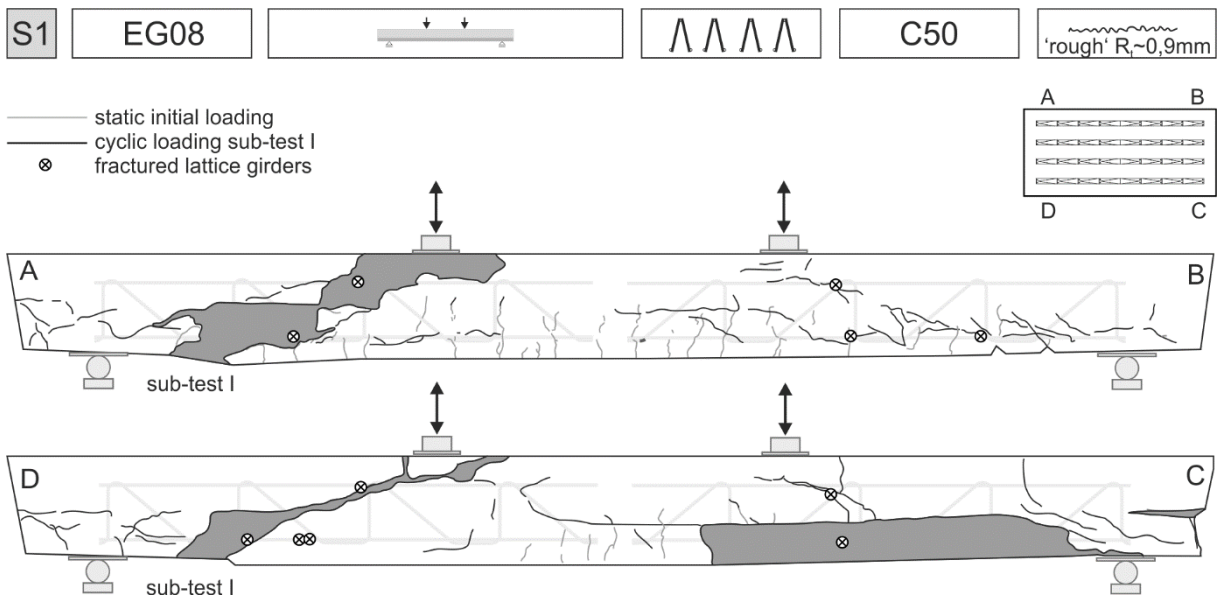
Test parameters, crack patterns and lattice girder fractures of specimen EG08
